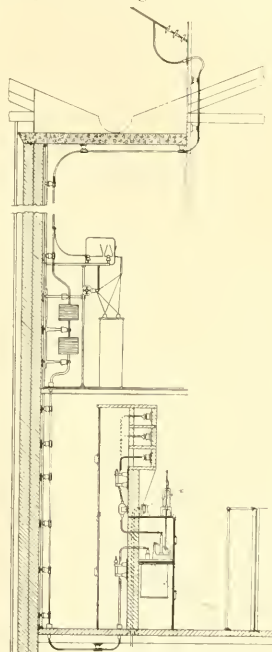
SECTION OF SWITCHBOARD IN STATION WITHOUT BASEMENT
